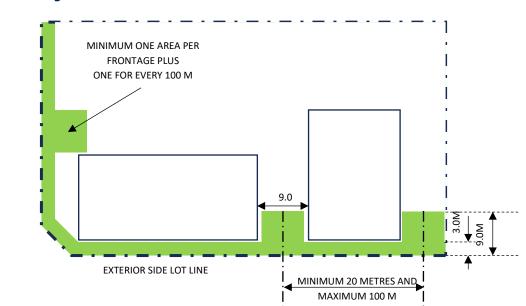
Front and Exterior Side Setbacks and Setback Areas
